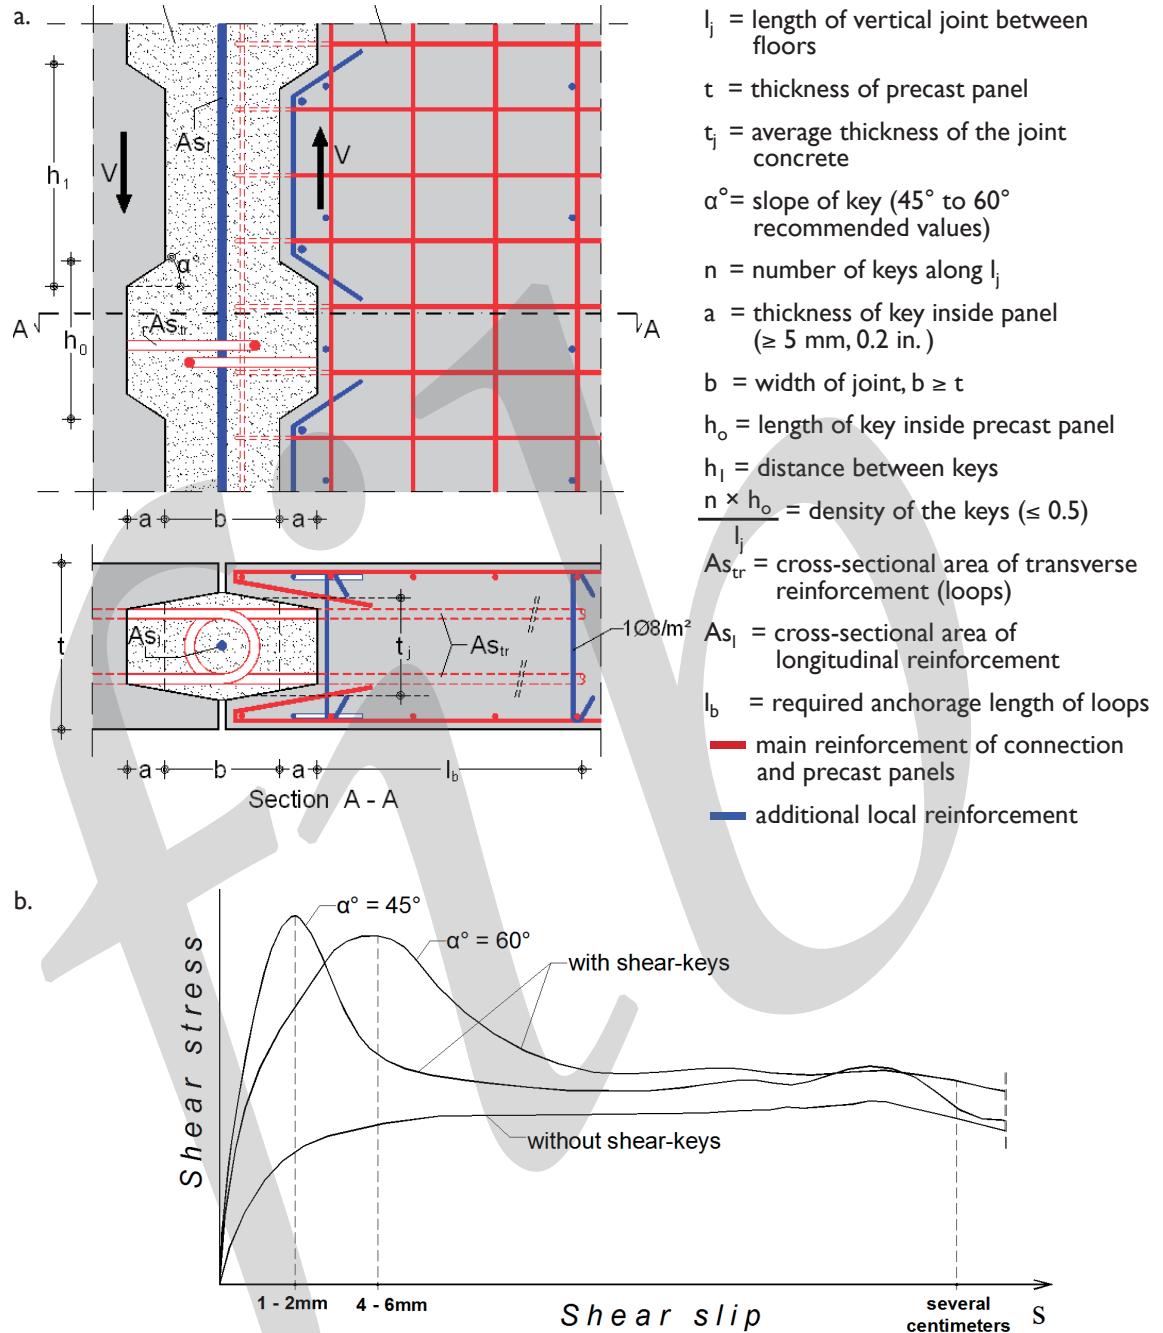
a. Typical transverse reinforcement in closed vertical shear connection and typical reinforcement of precast panels (shown in one panel only)
